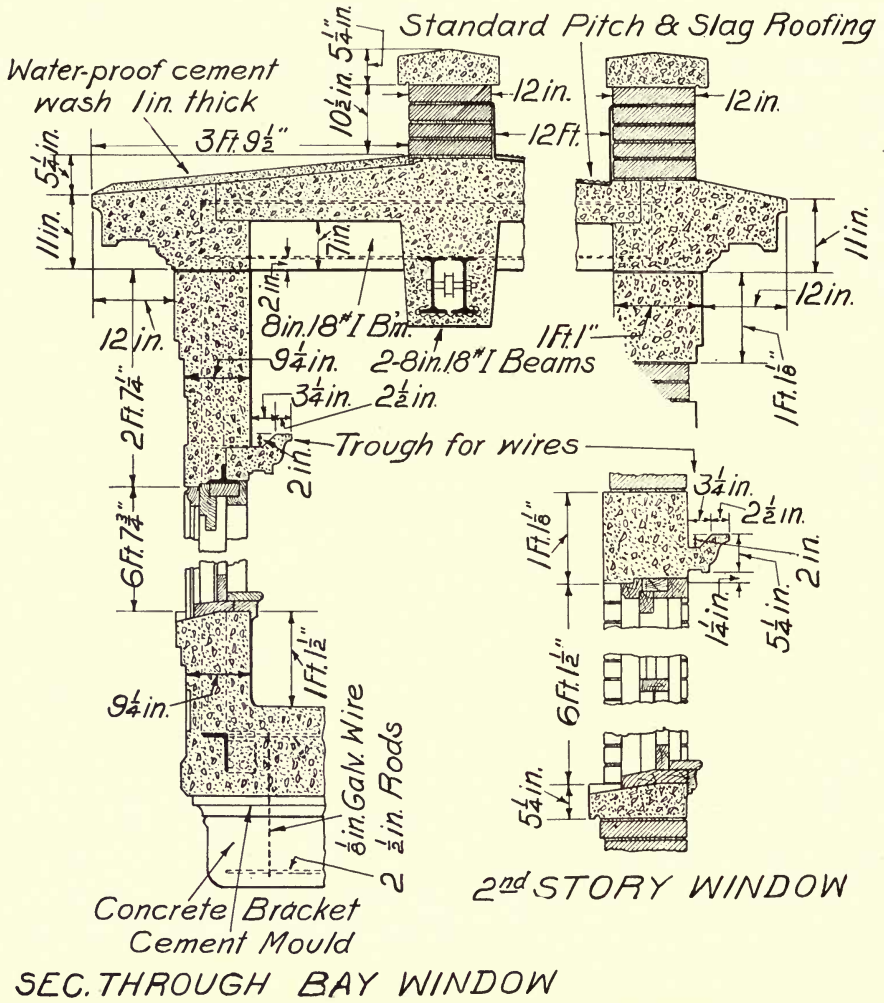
DETAILS OF CONSTRUCTION, KINGSBRIDGE SIGNAL TOWER, N. Y. C. & H. R. R. R.
